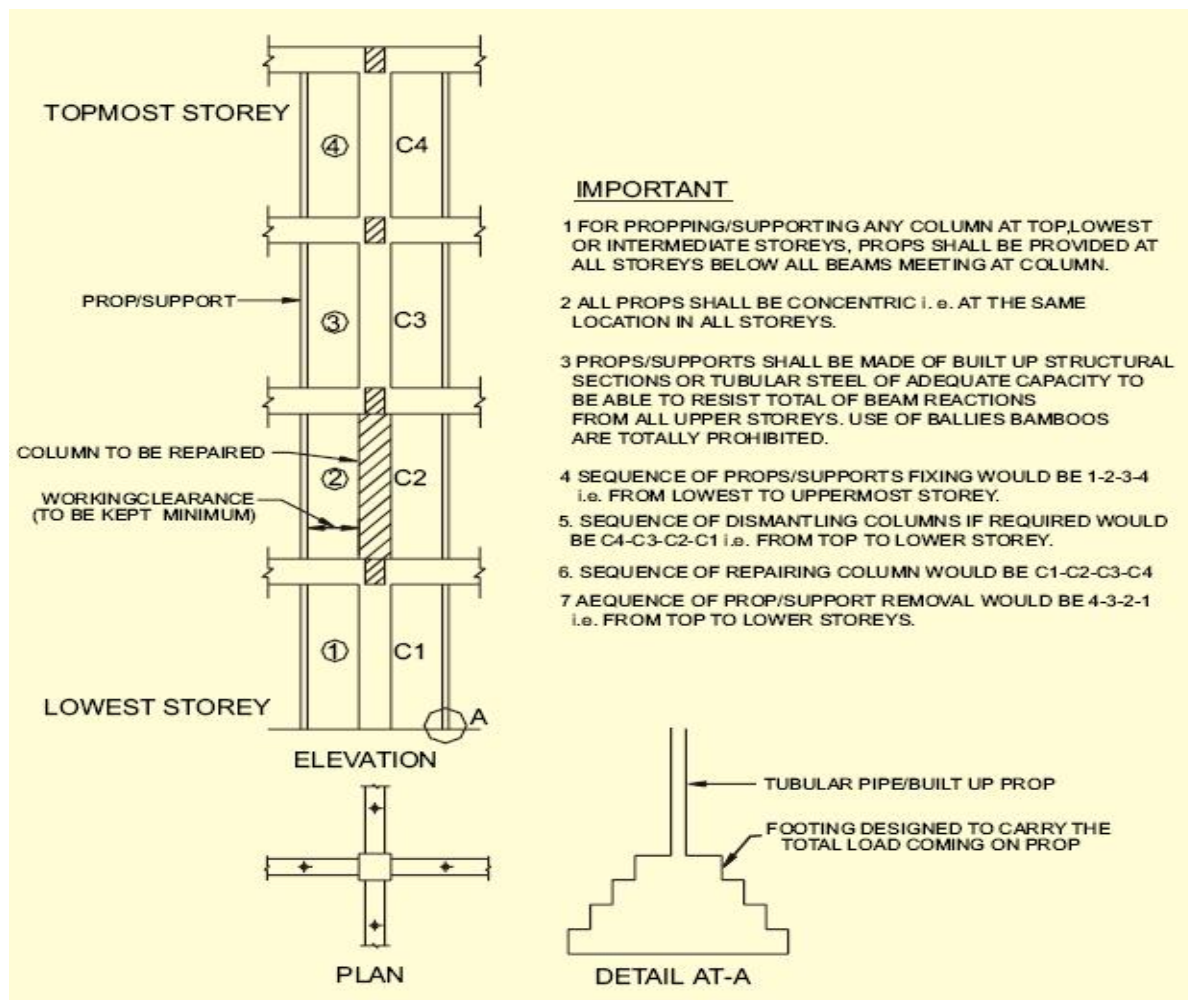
Typical Arrangement For Propping & Supporting a Column to Relieve at Form Load
